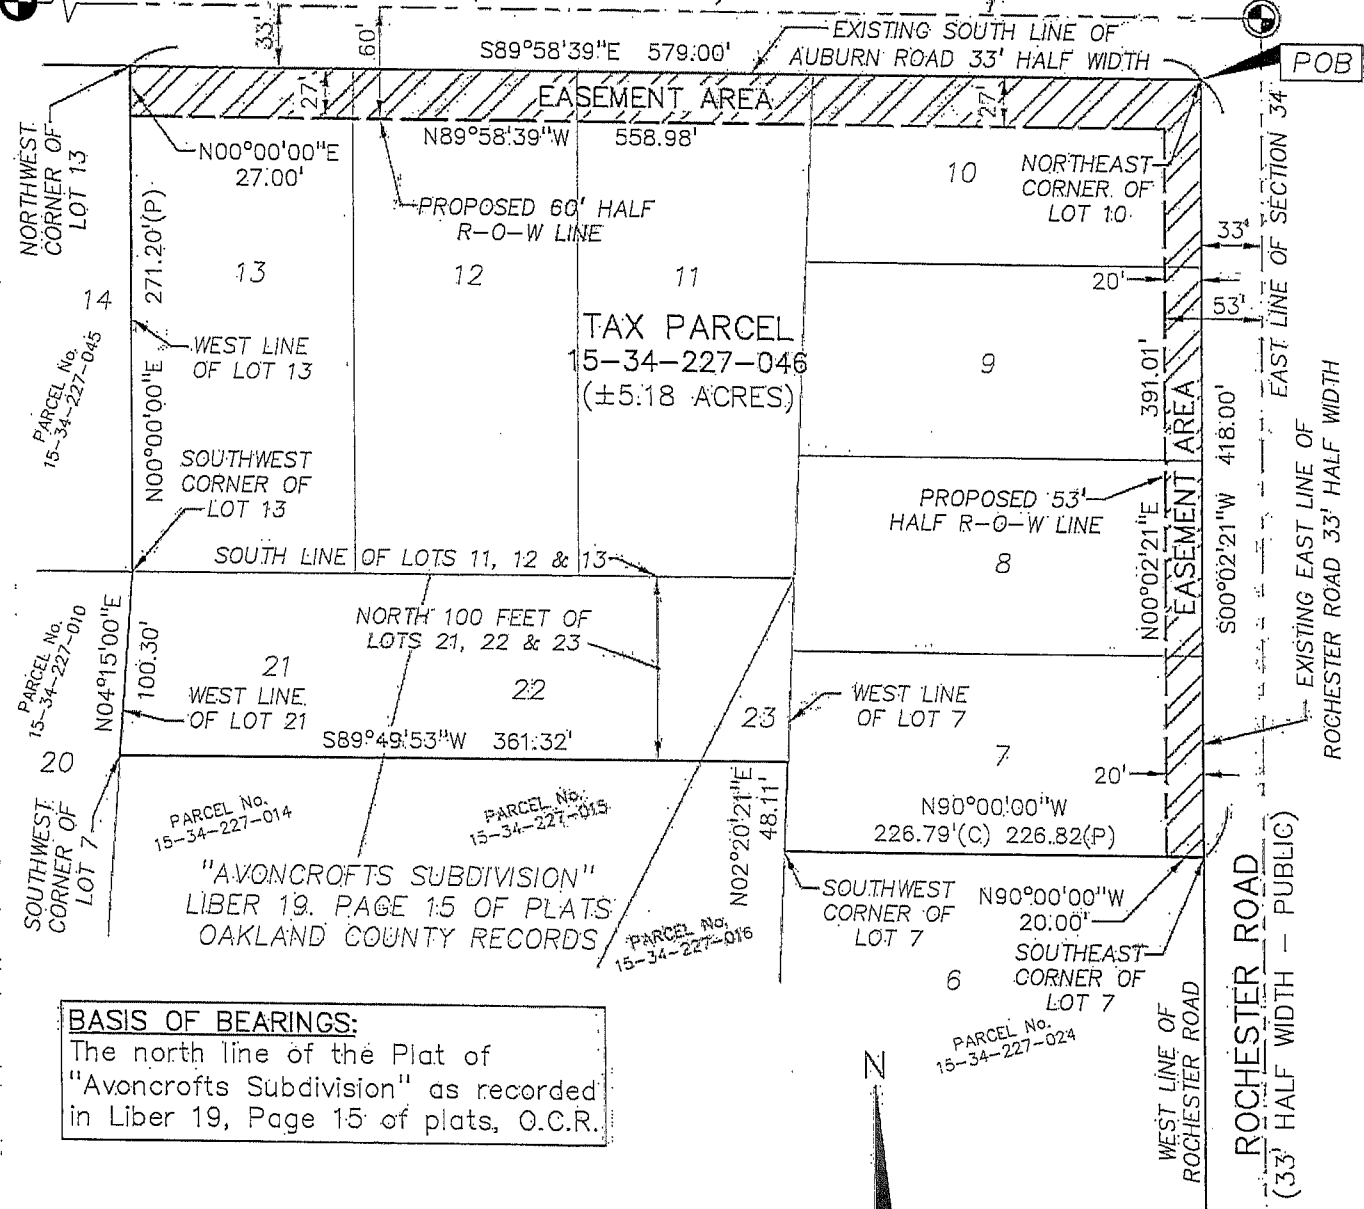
EXHIBIT B SKETCH OF HIGHWAY EASEMENT
